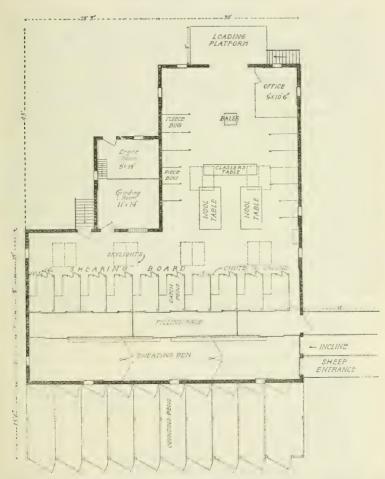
Floor plan of shearing shed. This plan includes the features of Australian sheds.
